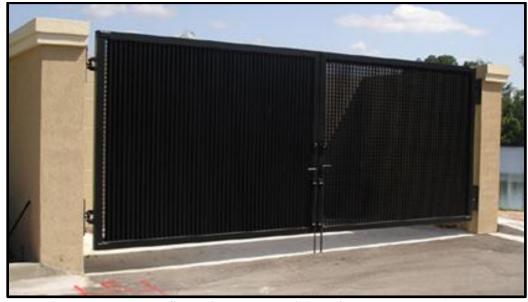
Proposed Screening Example 2 (Provided by Walmart)
